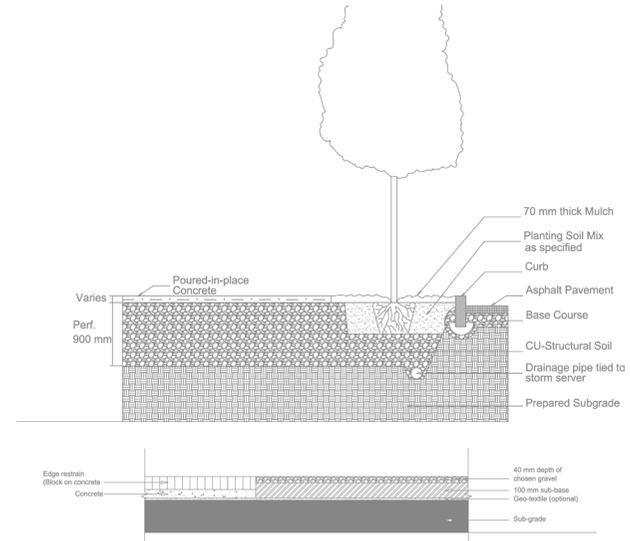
Plating on sidewalk detail & link between pavers detail
